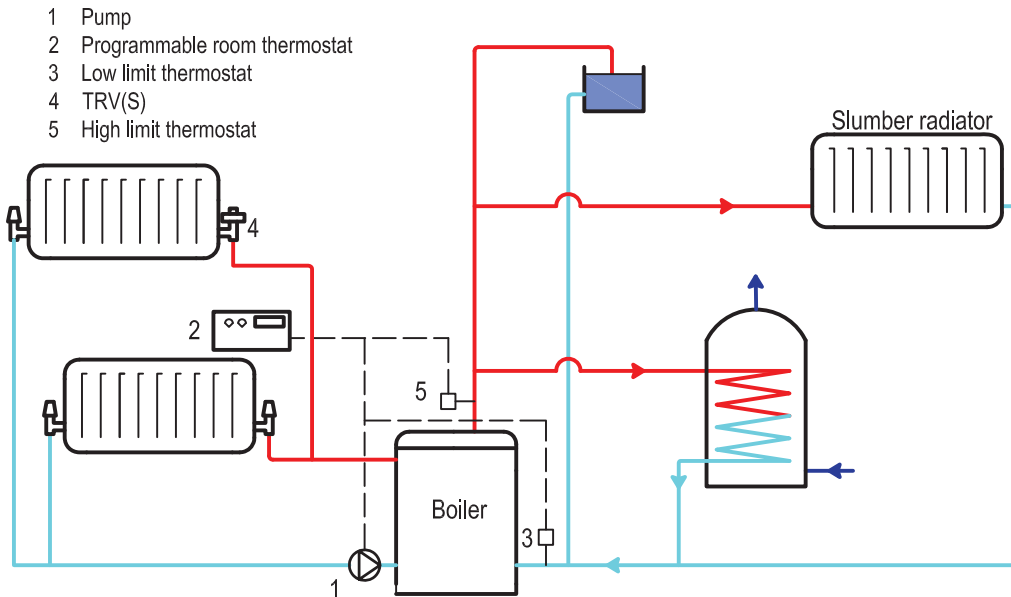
Example of a possible schematic arrangement for solid fuel boiler with gravity hot water and one heating zone
